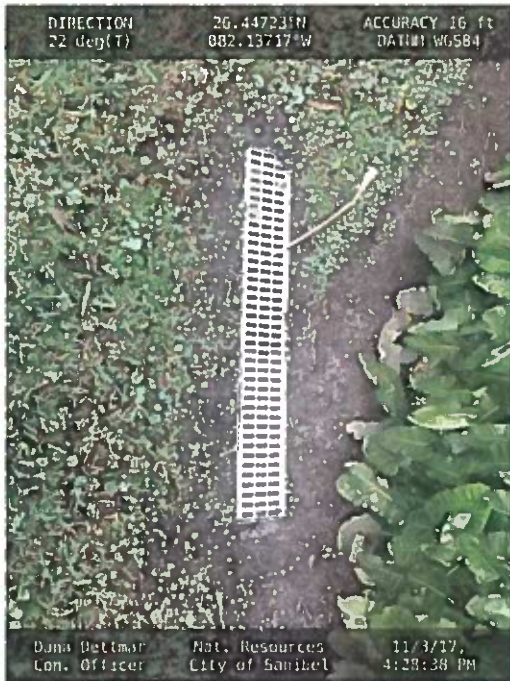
Underdrain in stormwater swale 4640 Rue Belle Mer.
